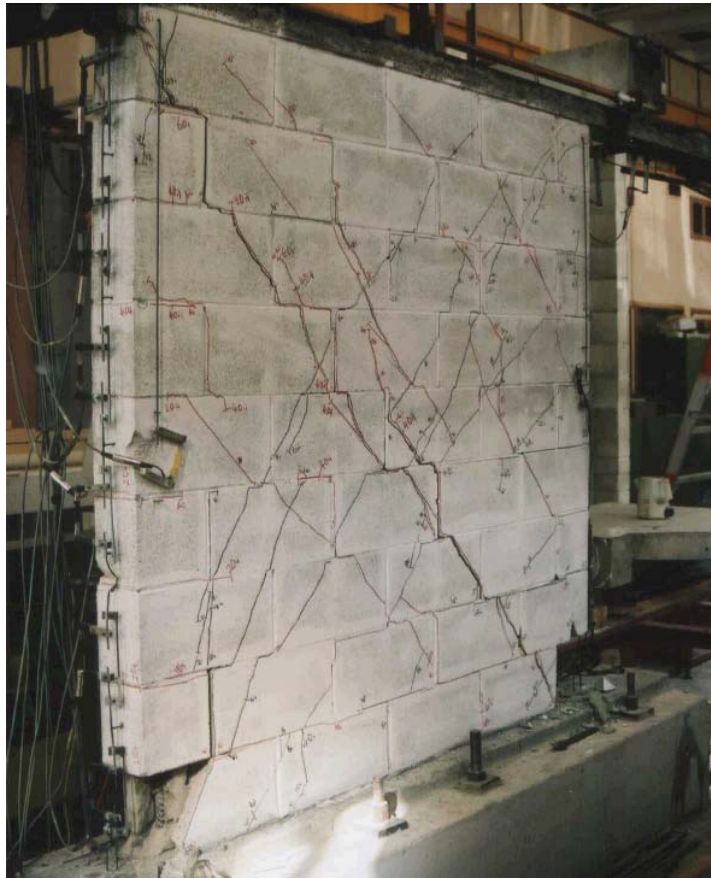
Series A, condition of Wall A1 at end of testing.
